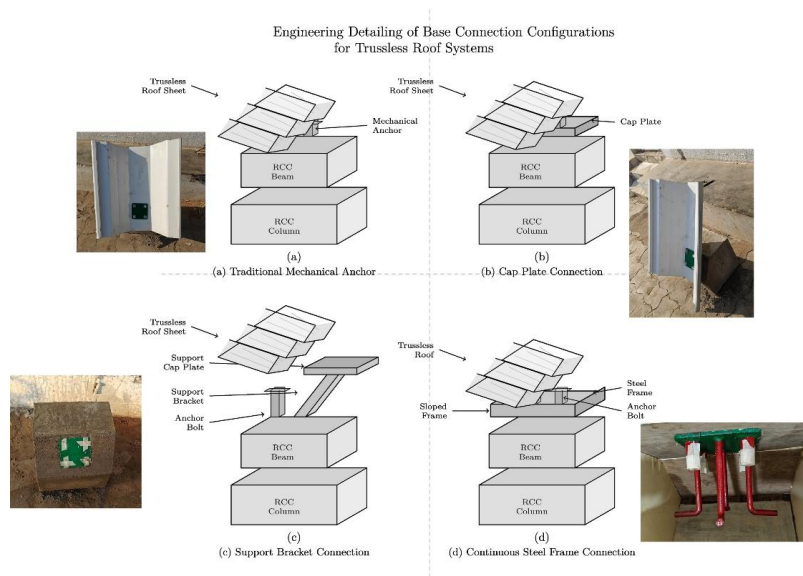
Engineering detailing of the four base connection configurations: (a) traditional anchor, (b) cap plate, (c) support bracket, (d) continuous steel frame. Source: authors.
